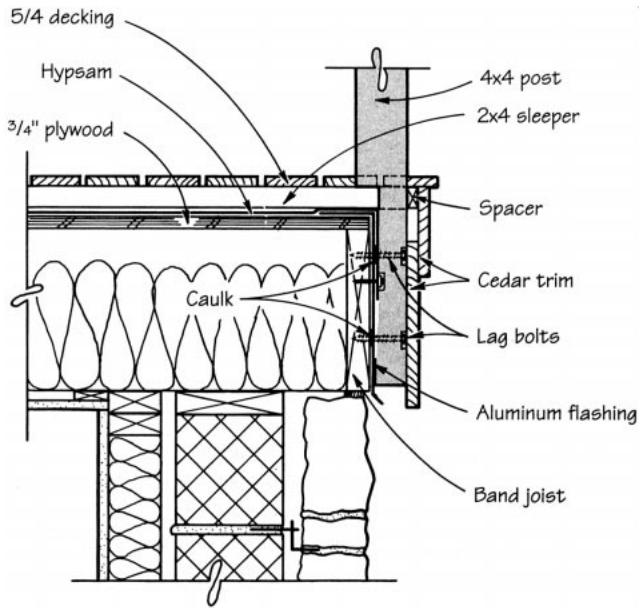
The posts for the deck railing are notched over the 2x4 sleepers and securely fastened to the band joist with lag bolts. Caulking the lag-bolt penetrations with urethane caulk effectively keeps moisture out.
